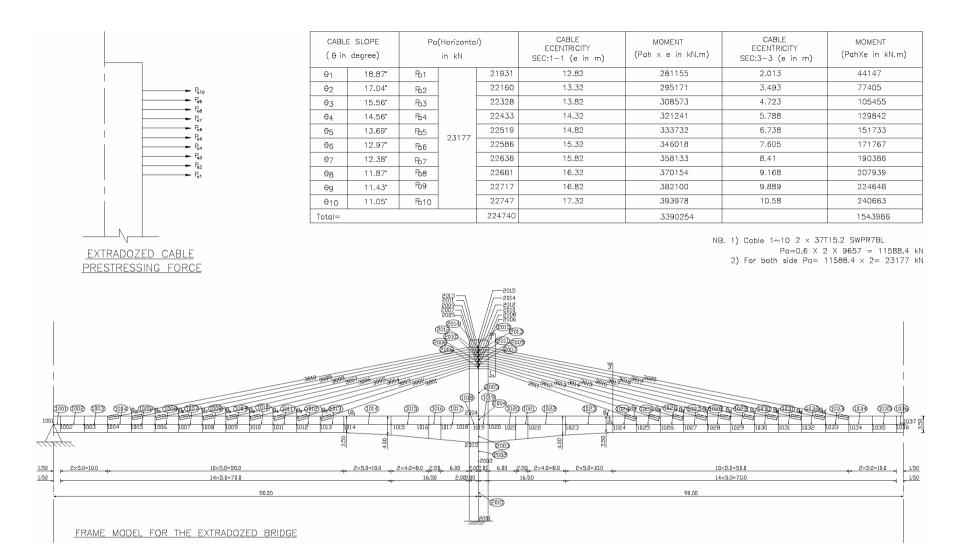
Cable Prestressing (Railway Provision Case)
